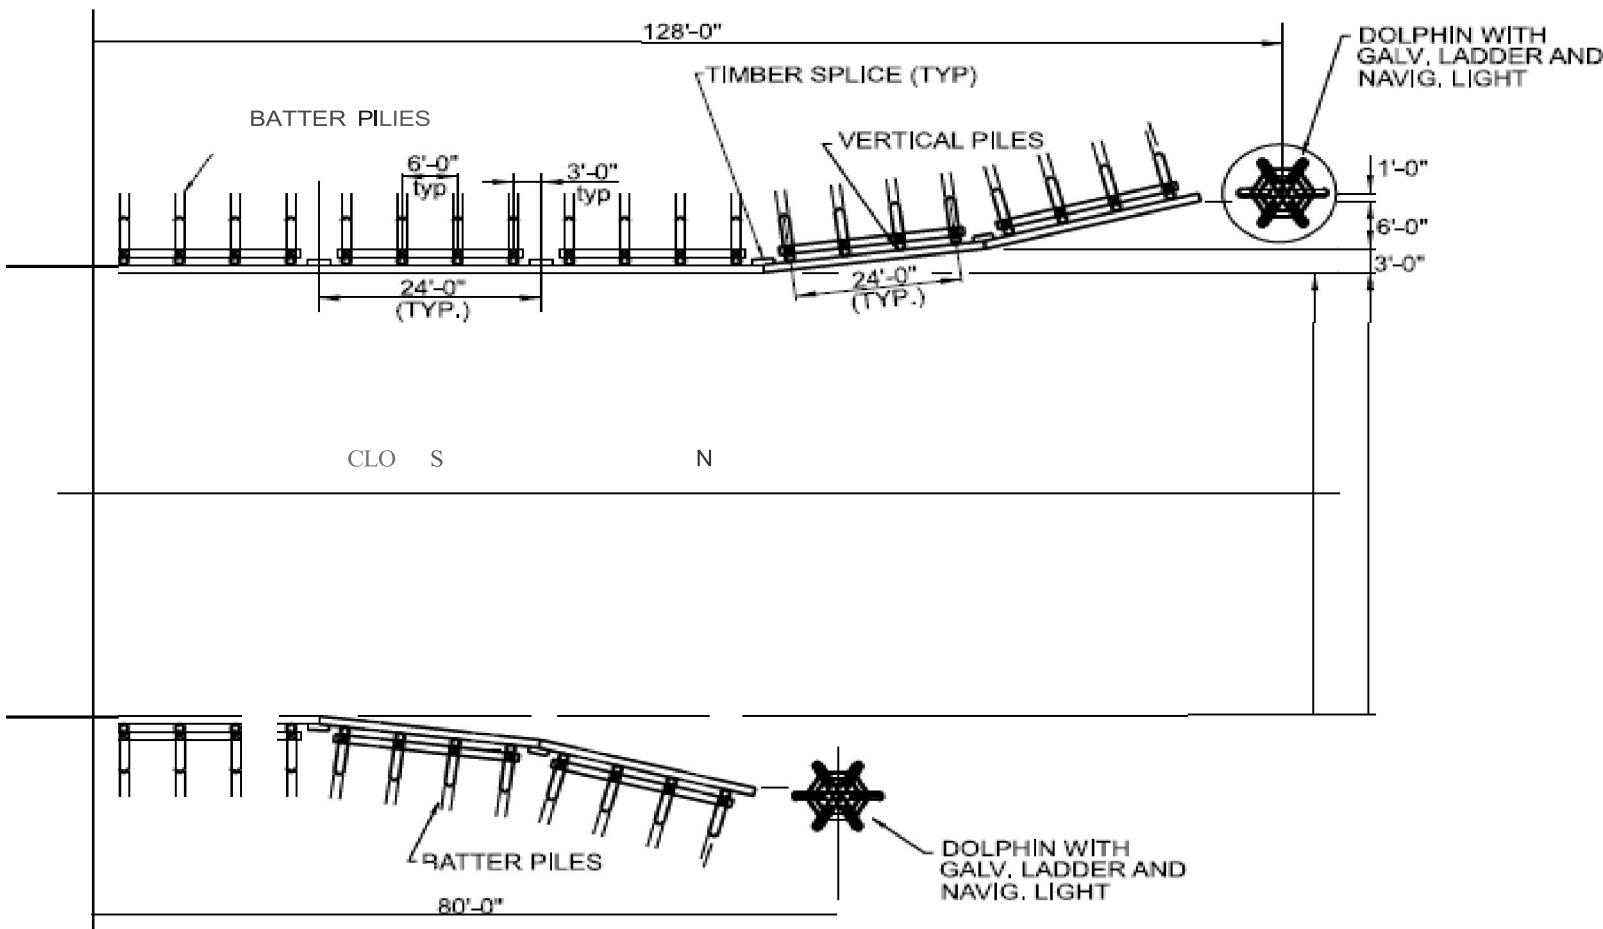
Plan – Guide walls, Fenders, and Dolphins
